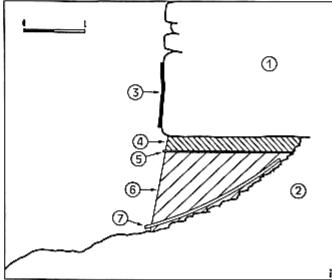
Section of central rock art panel of Shishkino site, with suggested method of alleviating severe undercutting: 1 - sound overlying rock, 2 - eroding facies, 3 - rock art, 4 - dry-packed cement grout, 5 - elastomeric membrane, 6 - cast concrete, 7 - slotted drainage pipes in thin sand layer.
